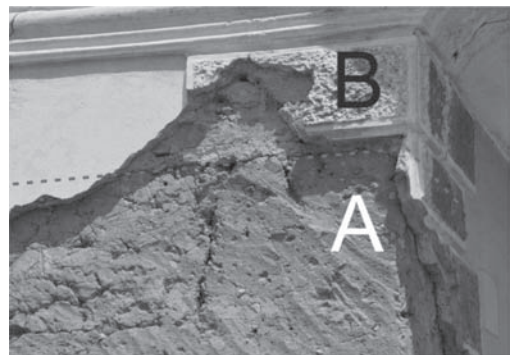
Detail of gable end. Double layered brick wall (B) above rammed earth walls (A). The brick layer is like a “collar” of the house.
